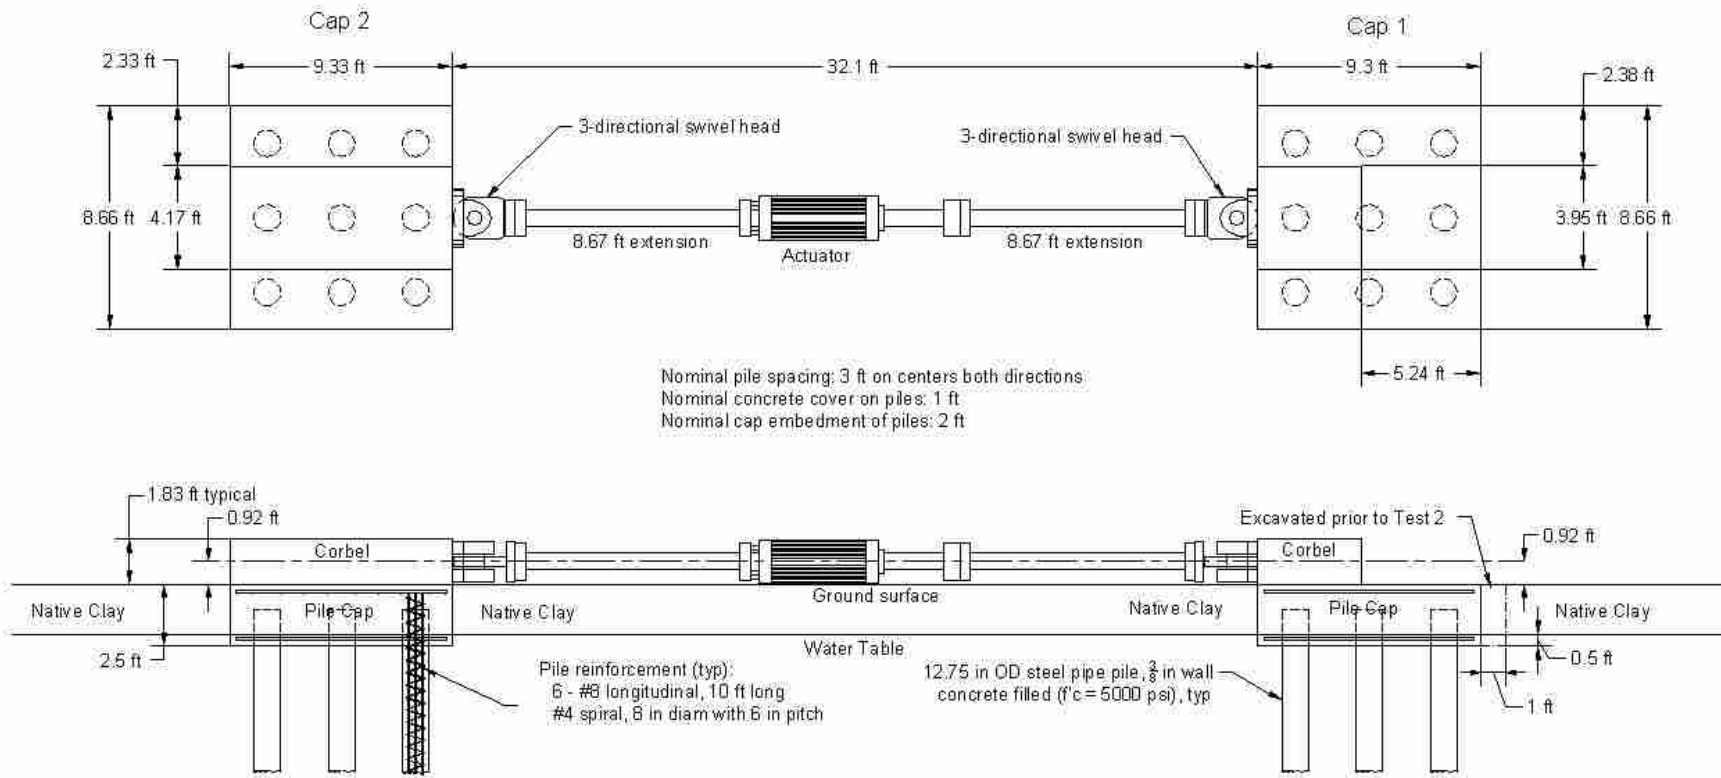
Plan and profile drawings of pile caps 1 and 2 during Test 1 when the pile groups were pulled together by the actuator. During Test 2 the soil adjacent to the pile cap was excavated to the base of the cap and the pile caps were pushed apart by the actuator.
